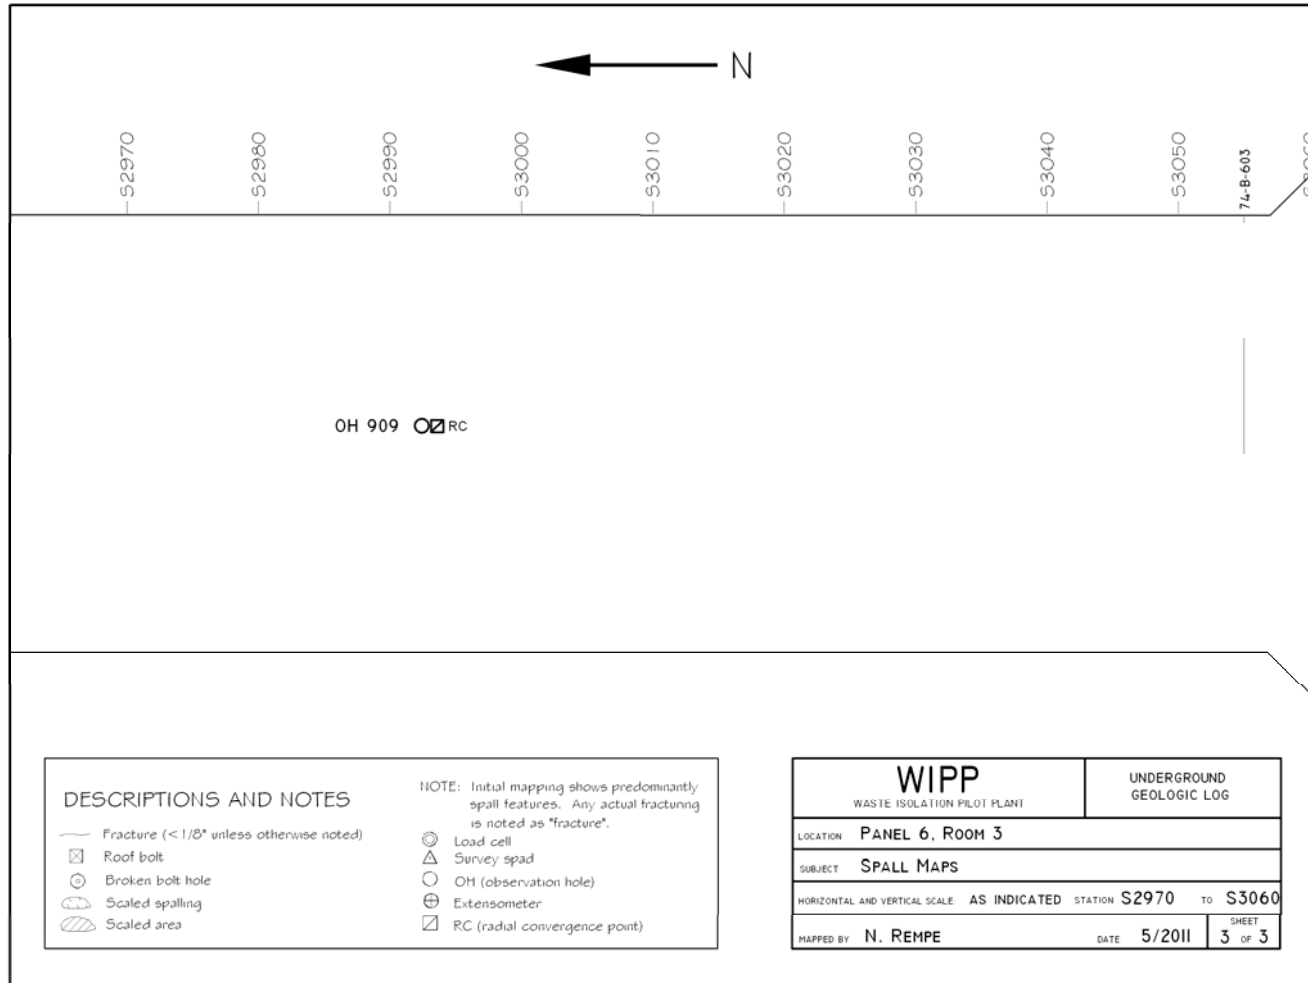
Panel 6 Room 3, S2770-S3060 Roof Fractures (Sheet 3 of 3)
